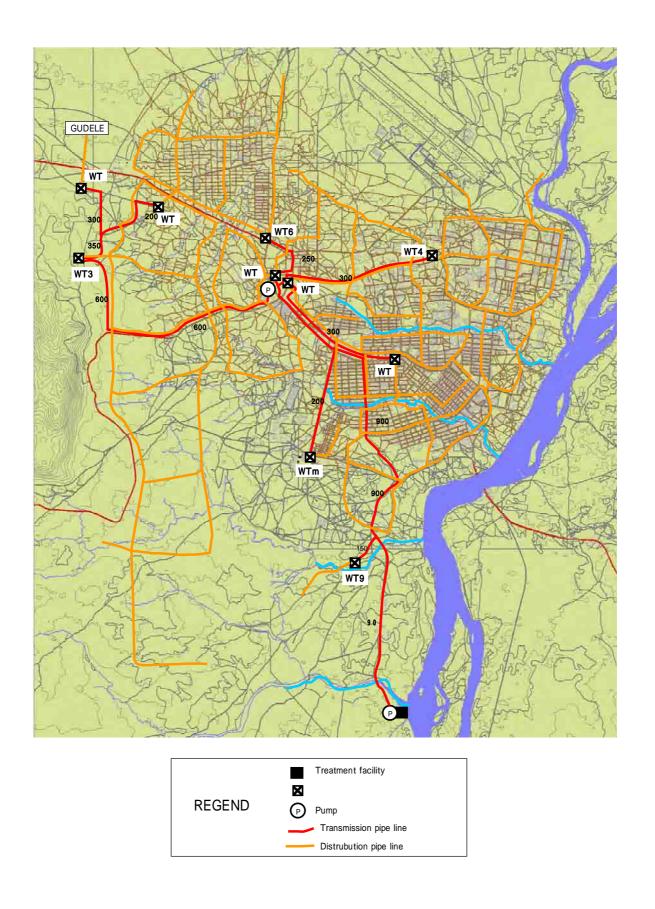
Layout Plan of Proposed Water Supply Facility
